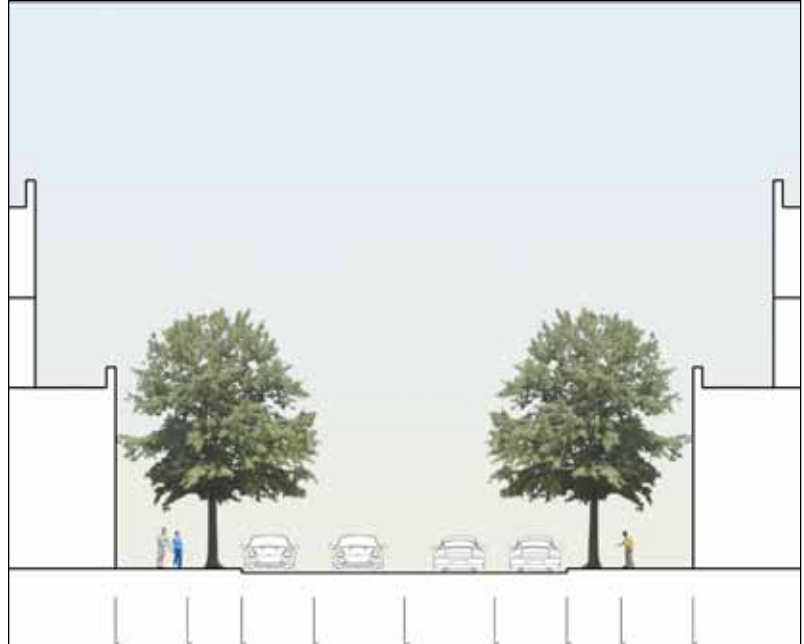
Residential streets provide two shared lanes for cars and bicycles, with two parking lanes, a planting strip and sidewalk.
